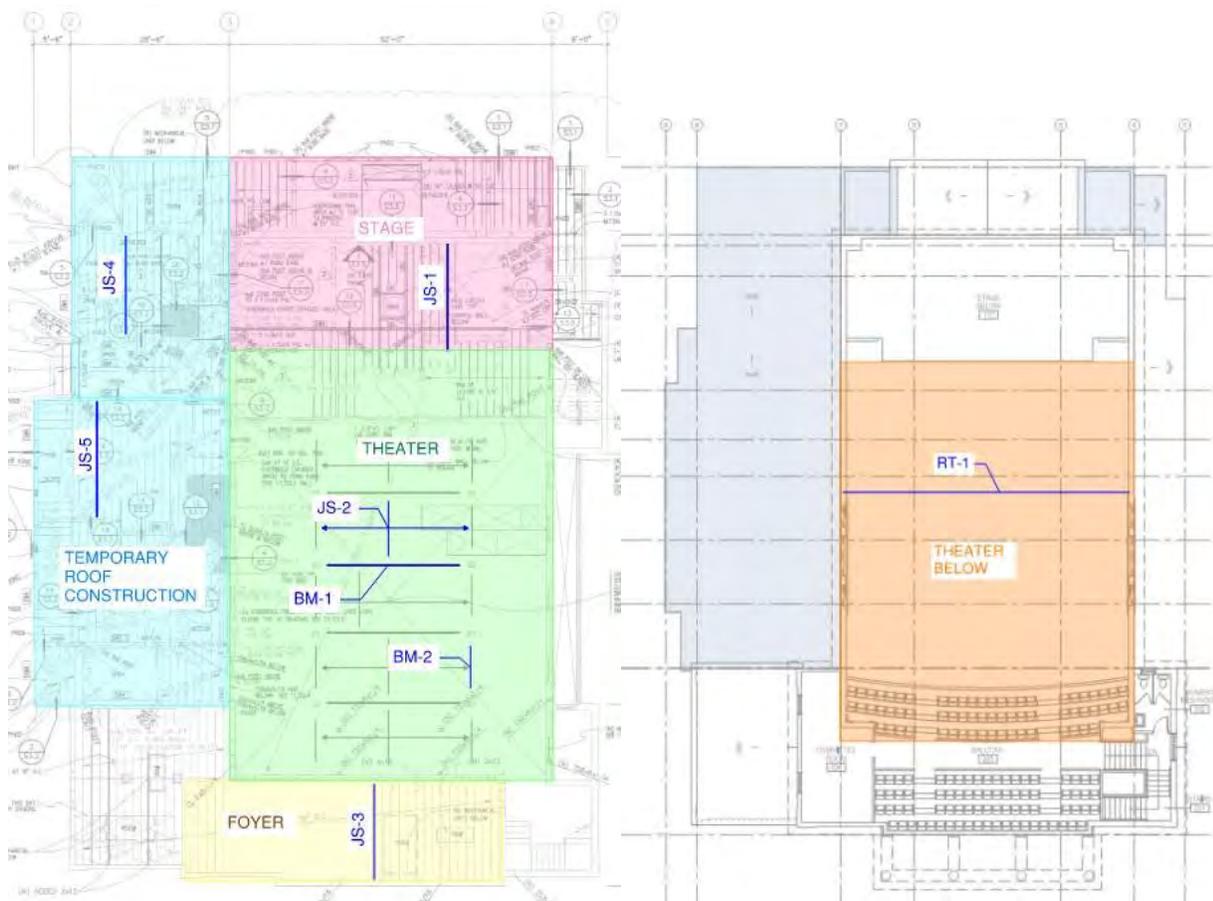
First floor key plan of members analyzed (left). Roof key plan of members analyzed (right).
